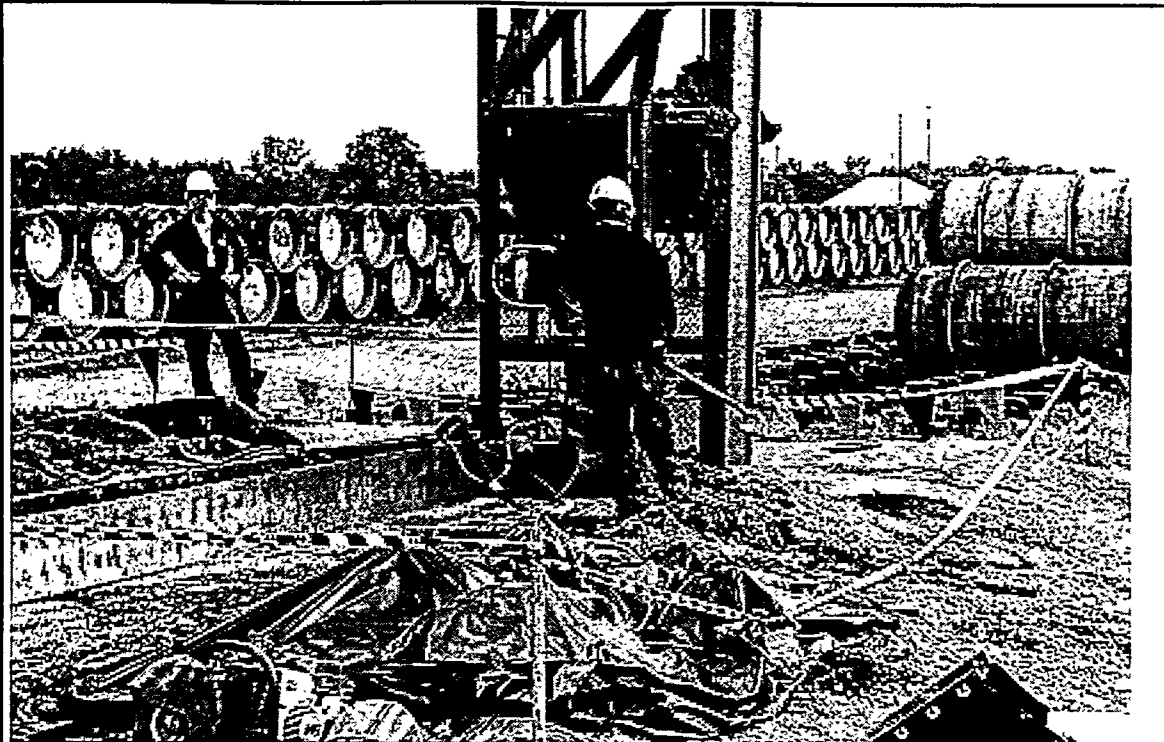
Photo Showing Large I-Beam Used to Position Mast and Heavy Strap Used to Help Hold Mast in Position against I-Beam
